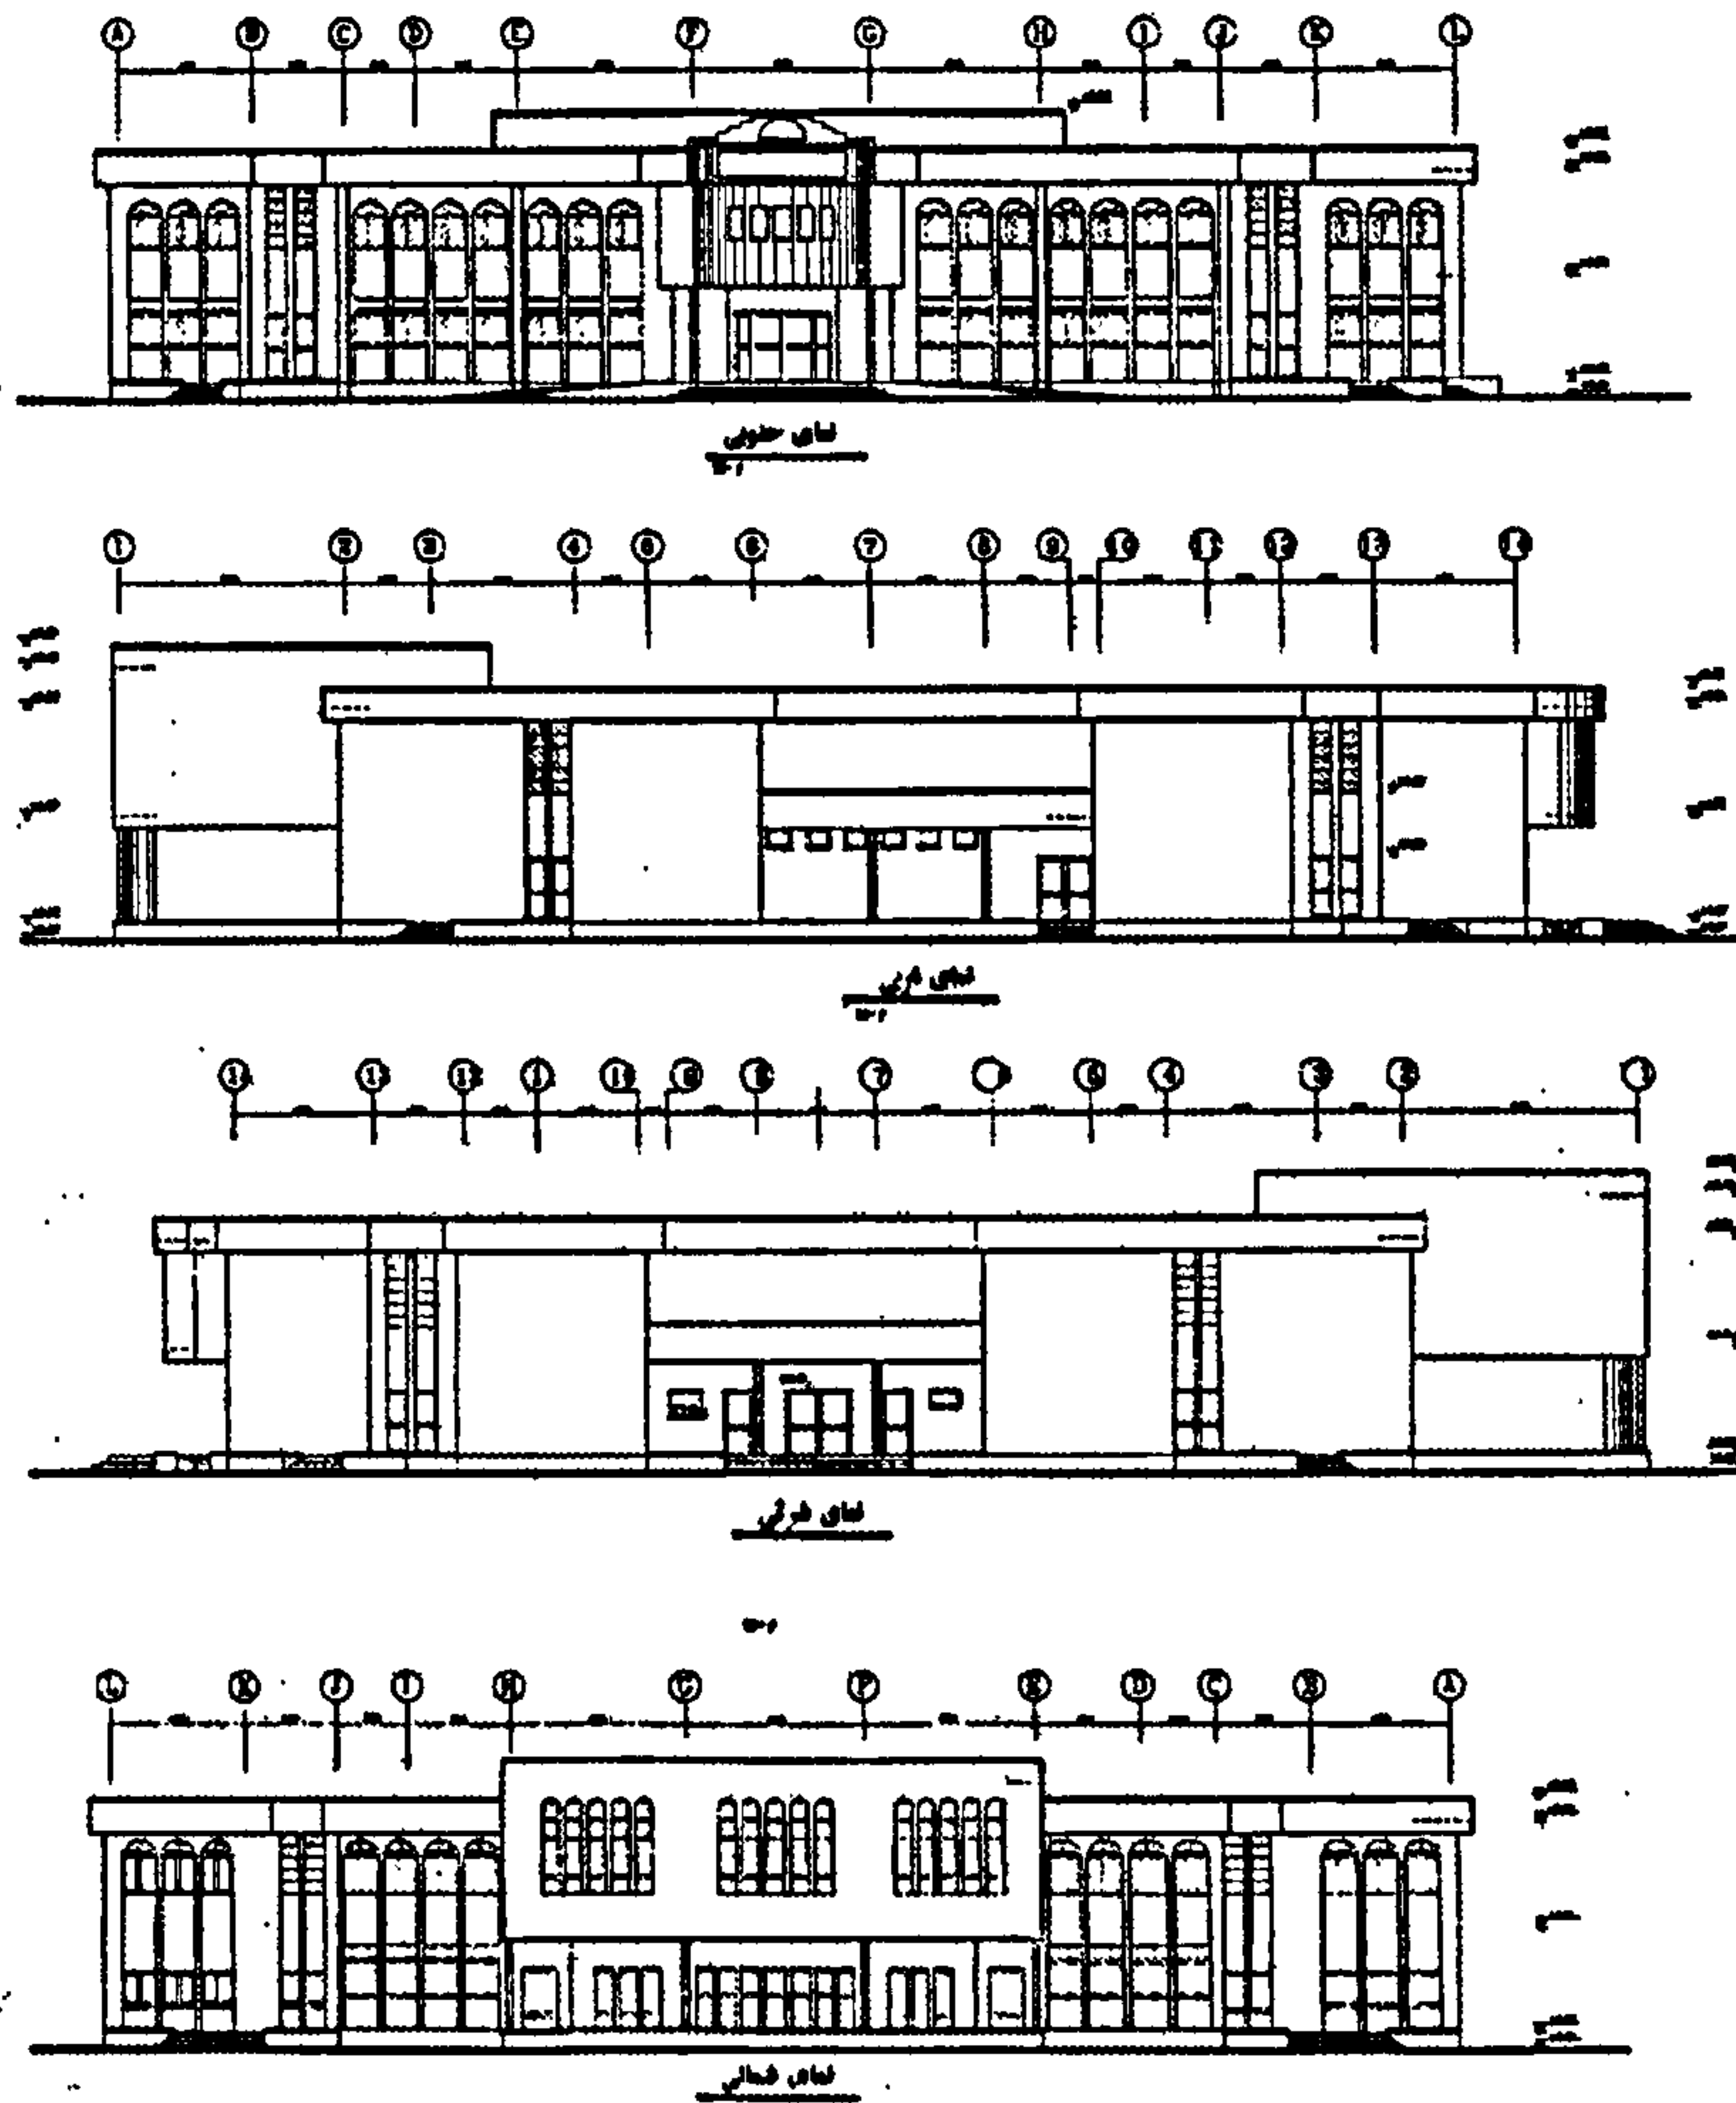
The south, west, east and north elevations of a secondary school with 12 classrooms (Number 7)
